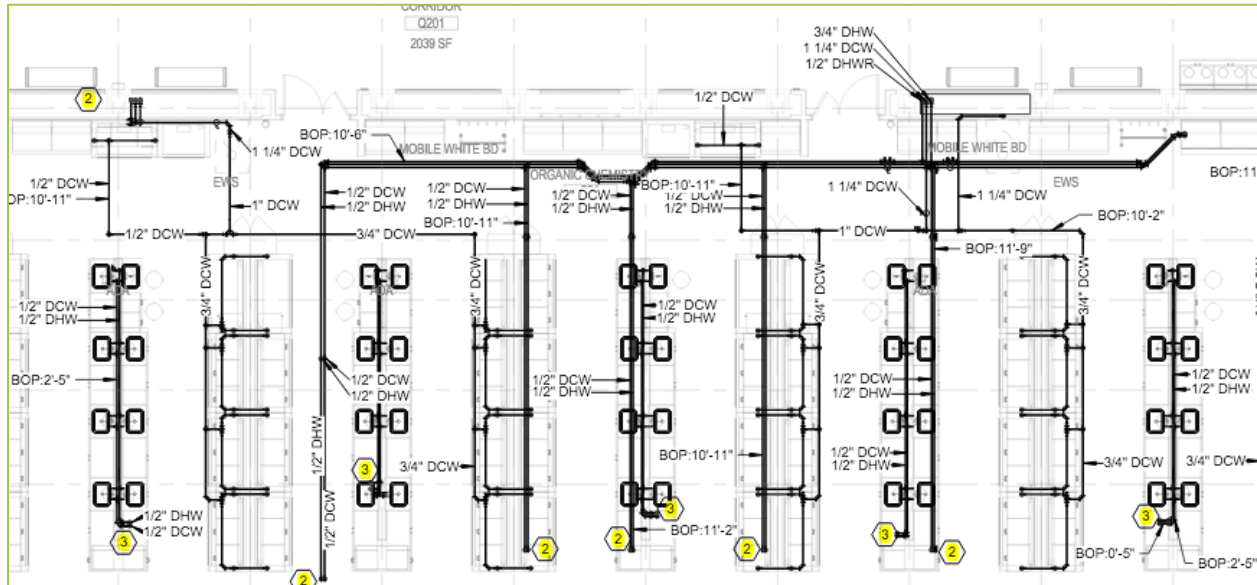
Typical lab area DW distribution, Source: building drawings [CD]
